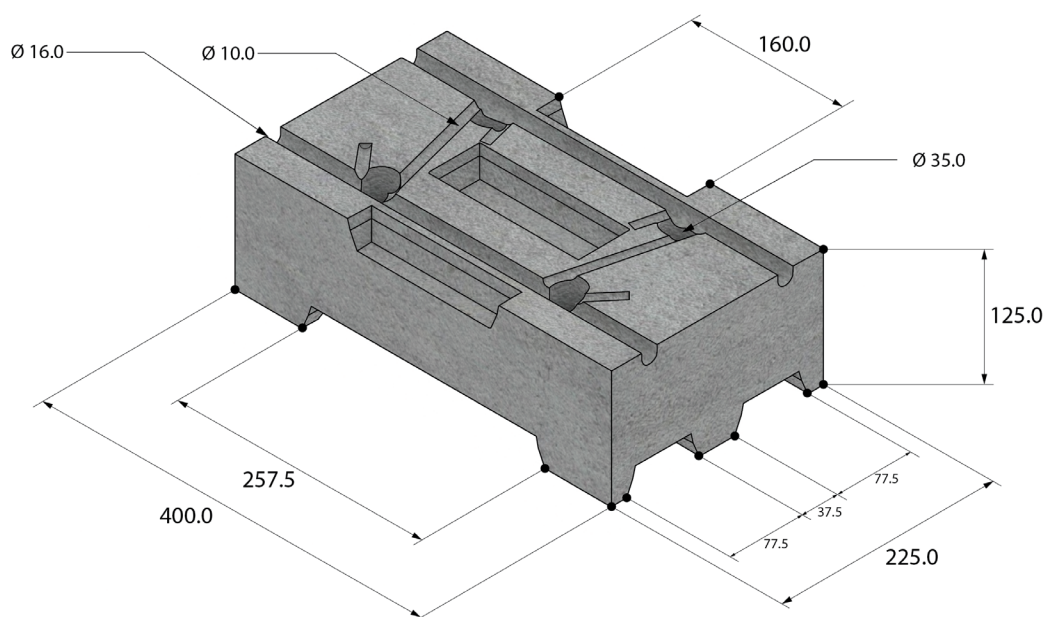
Annotated dimensions of the modular precast shear wall block (all dimensions are in mm) (author's own work)
